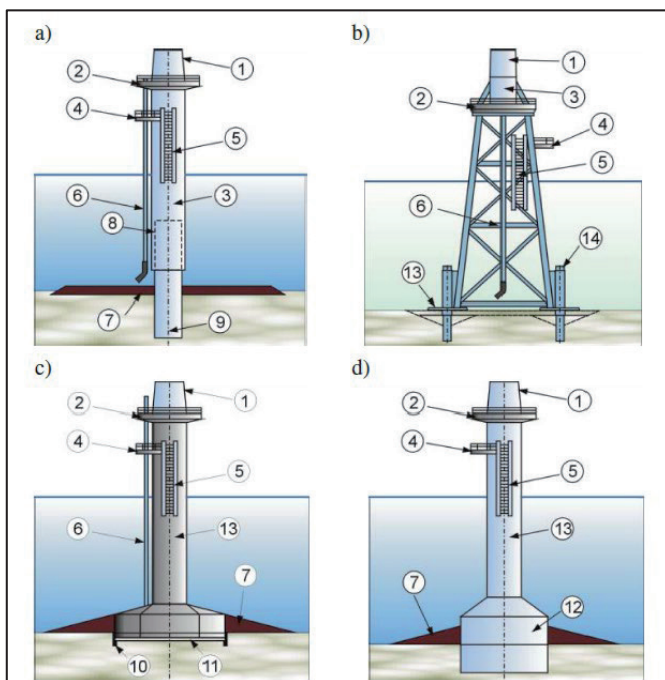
a) Monopile b) Jacket foundation c) Gravity-based foundation d) Suction foundation [3]
